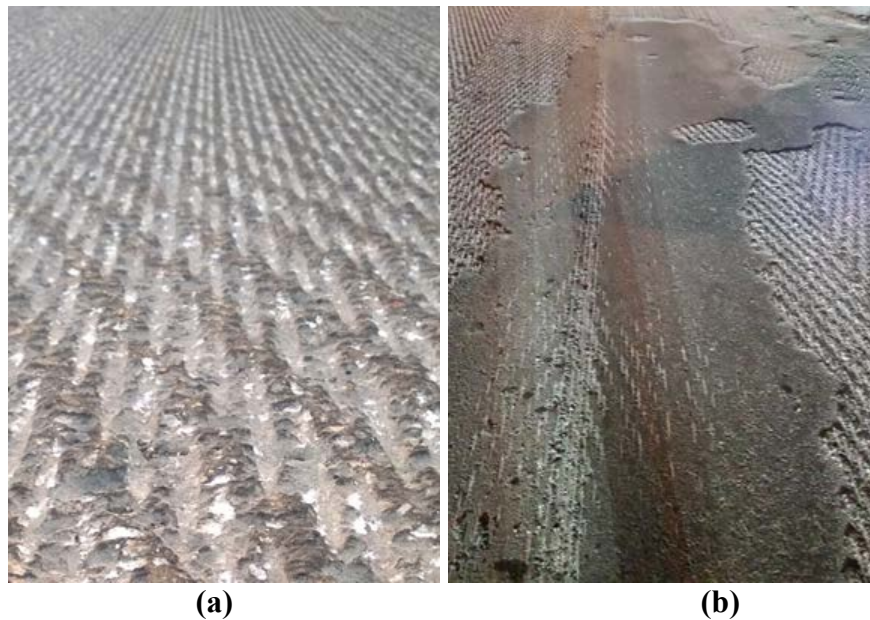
Surface Condition of Milled Section: (a) Uniform and (b) Scabbed.
